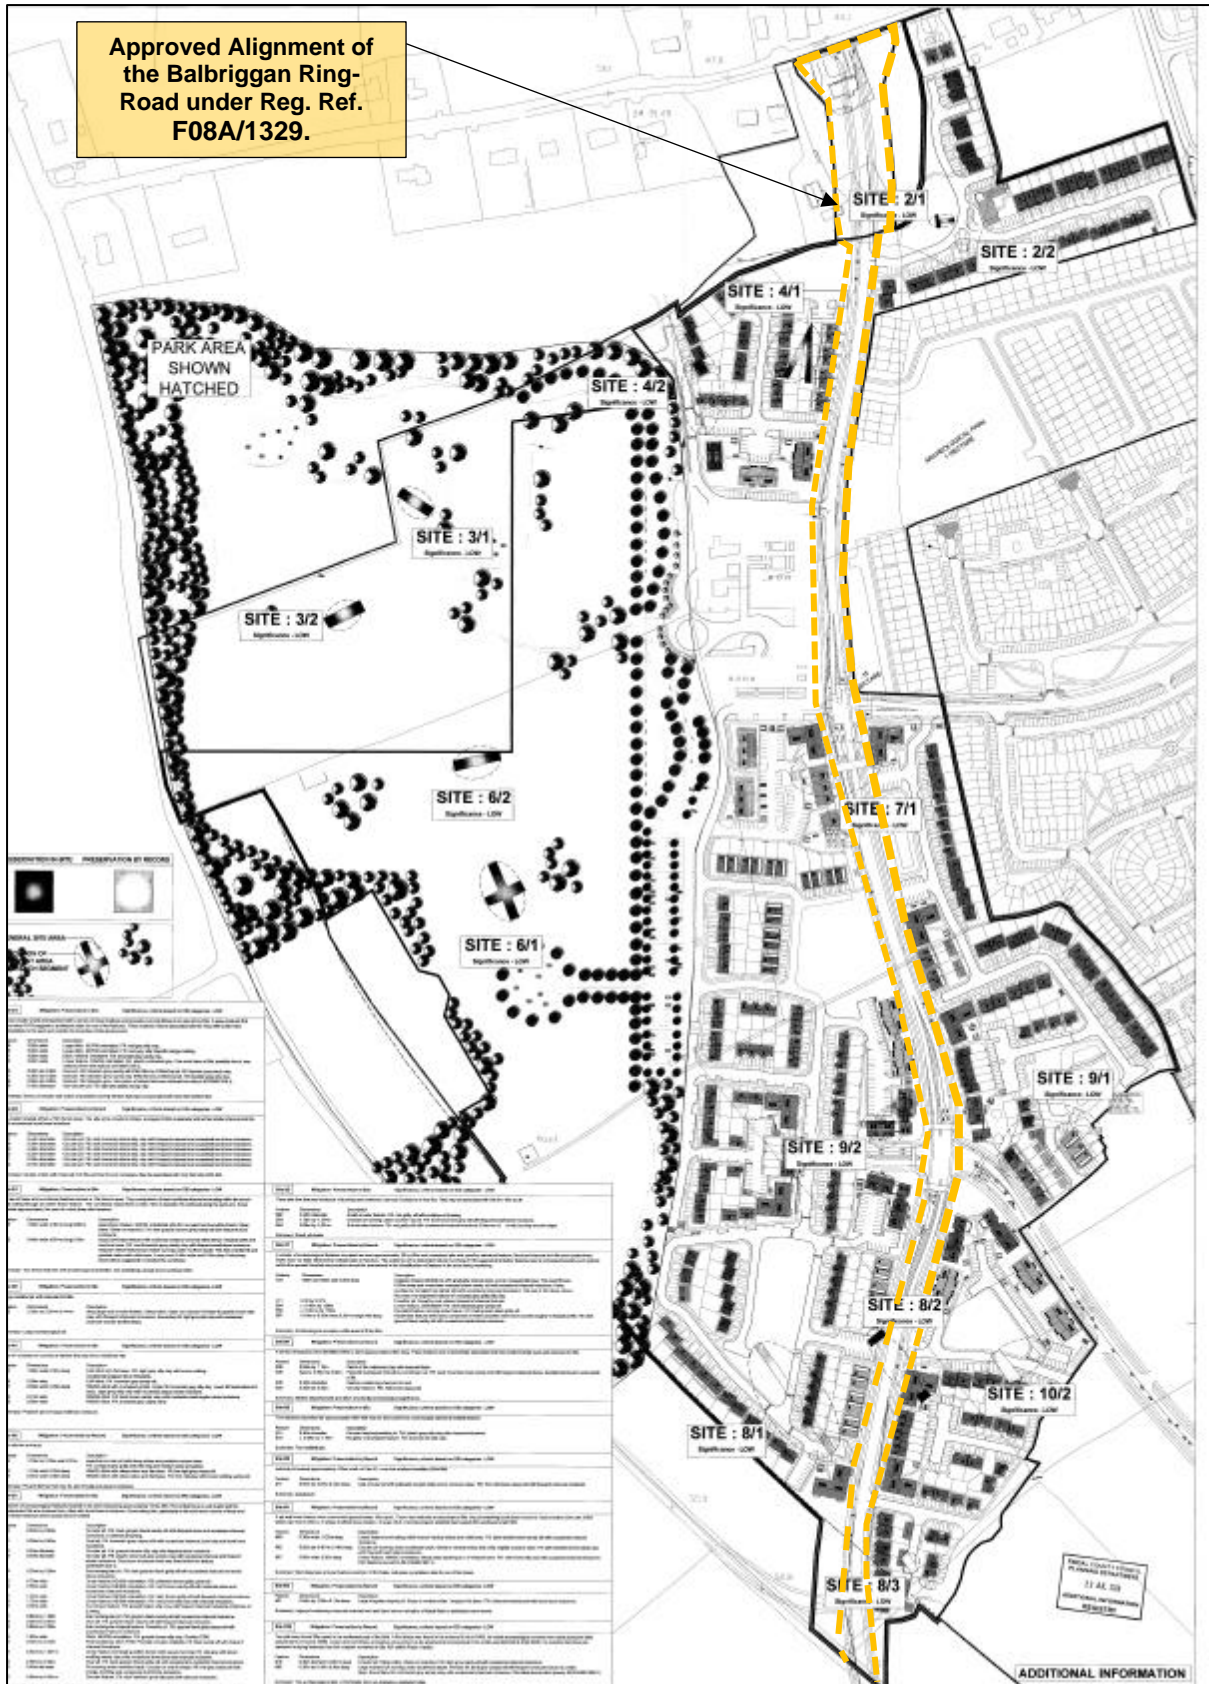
Extract from the approved site layout (Reg. Ref. F08A/1329).
